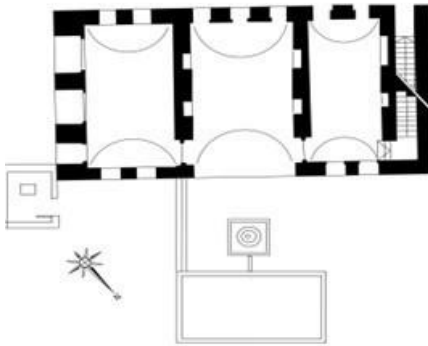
Erdebil Mansion plan (Çiftçi, 2007)
